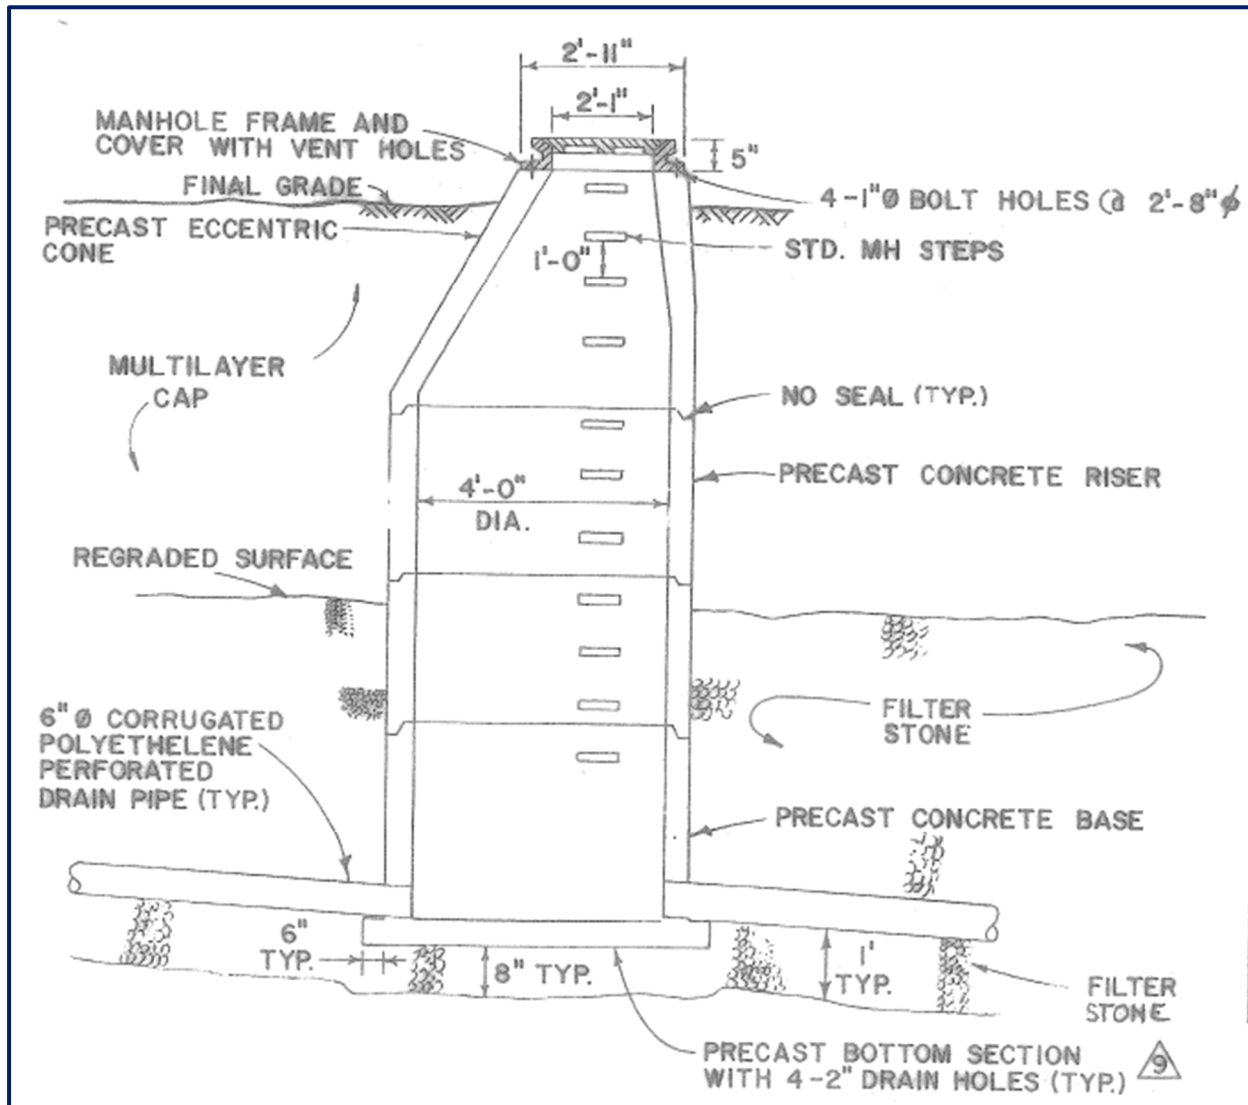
As-Built Cross Section of Typical Cleanout Layout (USACE, 1992, Sheet 28)
